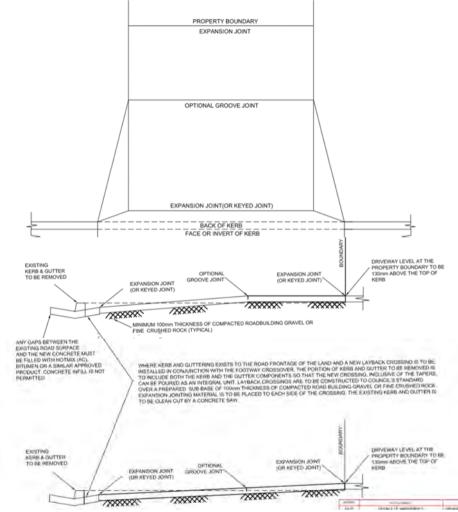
ACCESSWAY CONSTRUCTION STANDARDS
